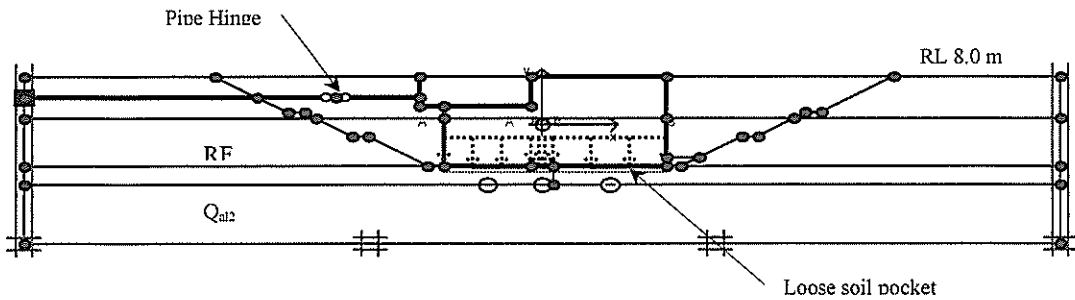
Finite Element Model with Cooling Water Pipe and Hinge (N-S)
